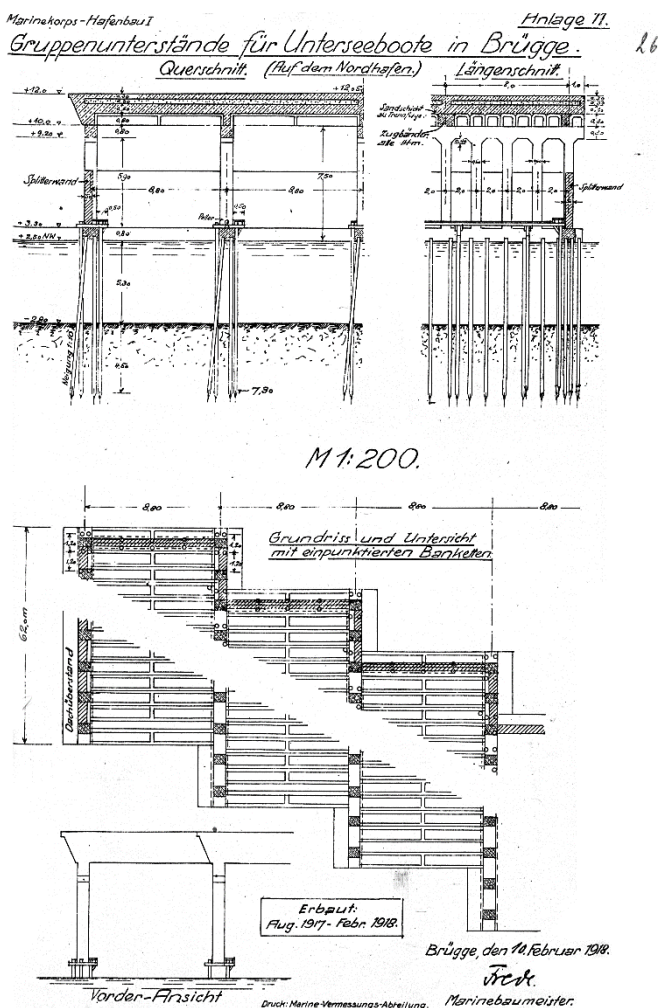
Plan, sections and facade of the *Gruppenunterstände*, 1918 (BA-MA).
